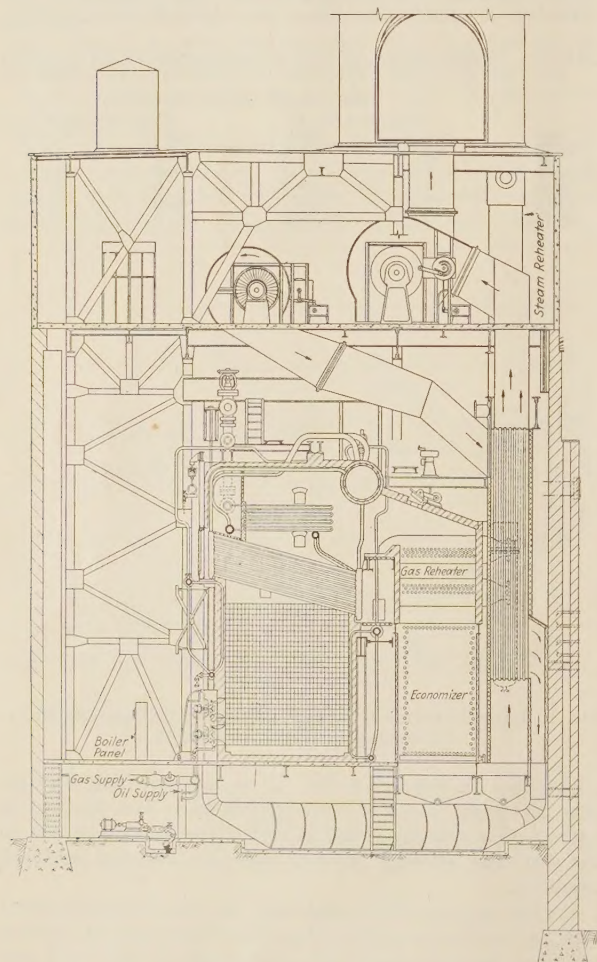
SECTIONAL ELEVATION OF THE 1400-LB PRESSURE BOILER USED IN LOAD-PICKUP TESTS
